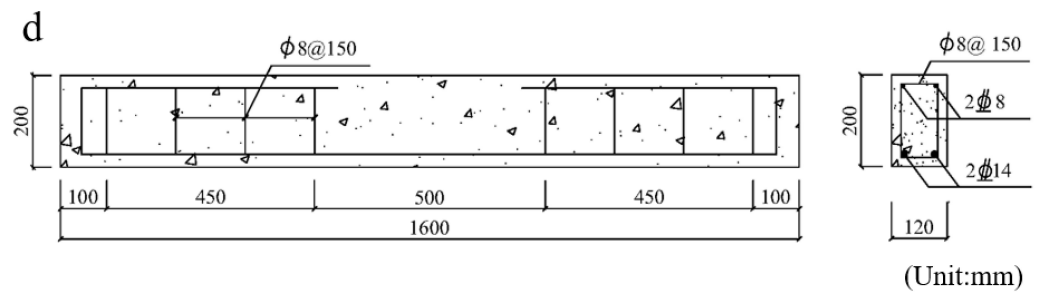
Detailed diagram of the reinforced concrete beam test. (a) Photo of the test setup; (b) Detailed photo of the sensors mounted on the RC beam; (c) Photo of cracks in the measurement region; (d) Reinforcement diagram of RC beam.
